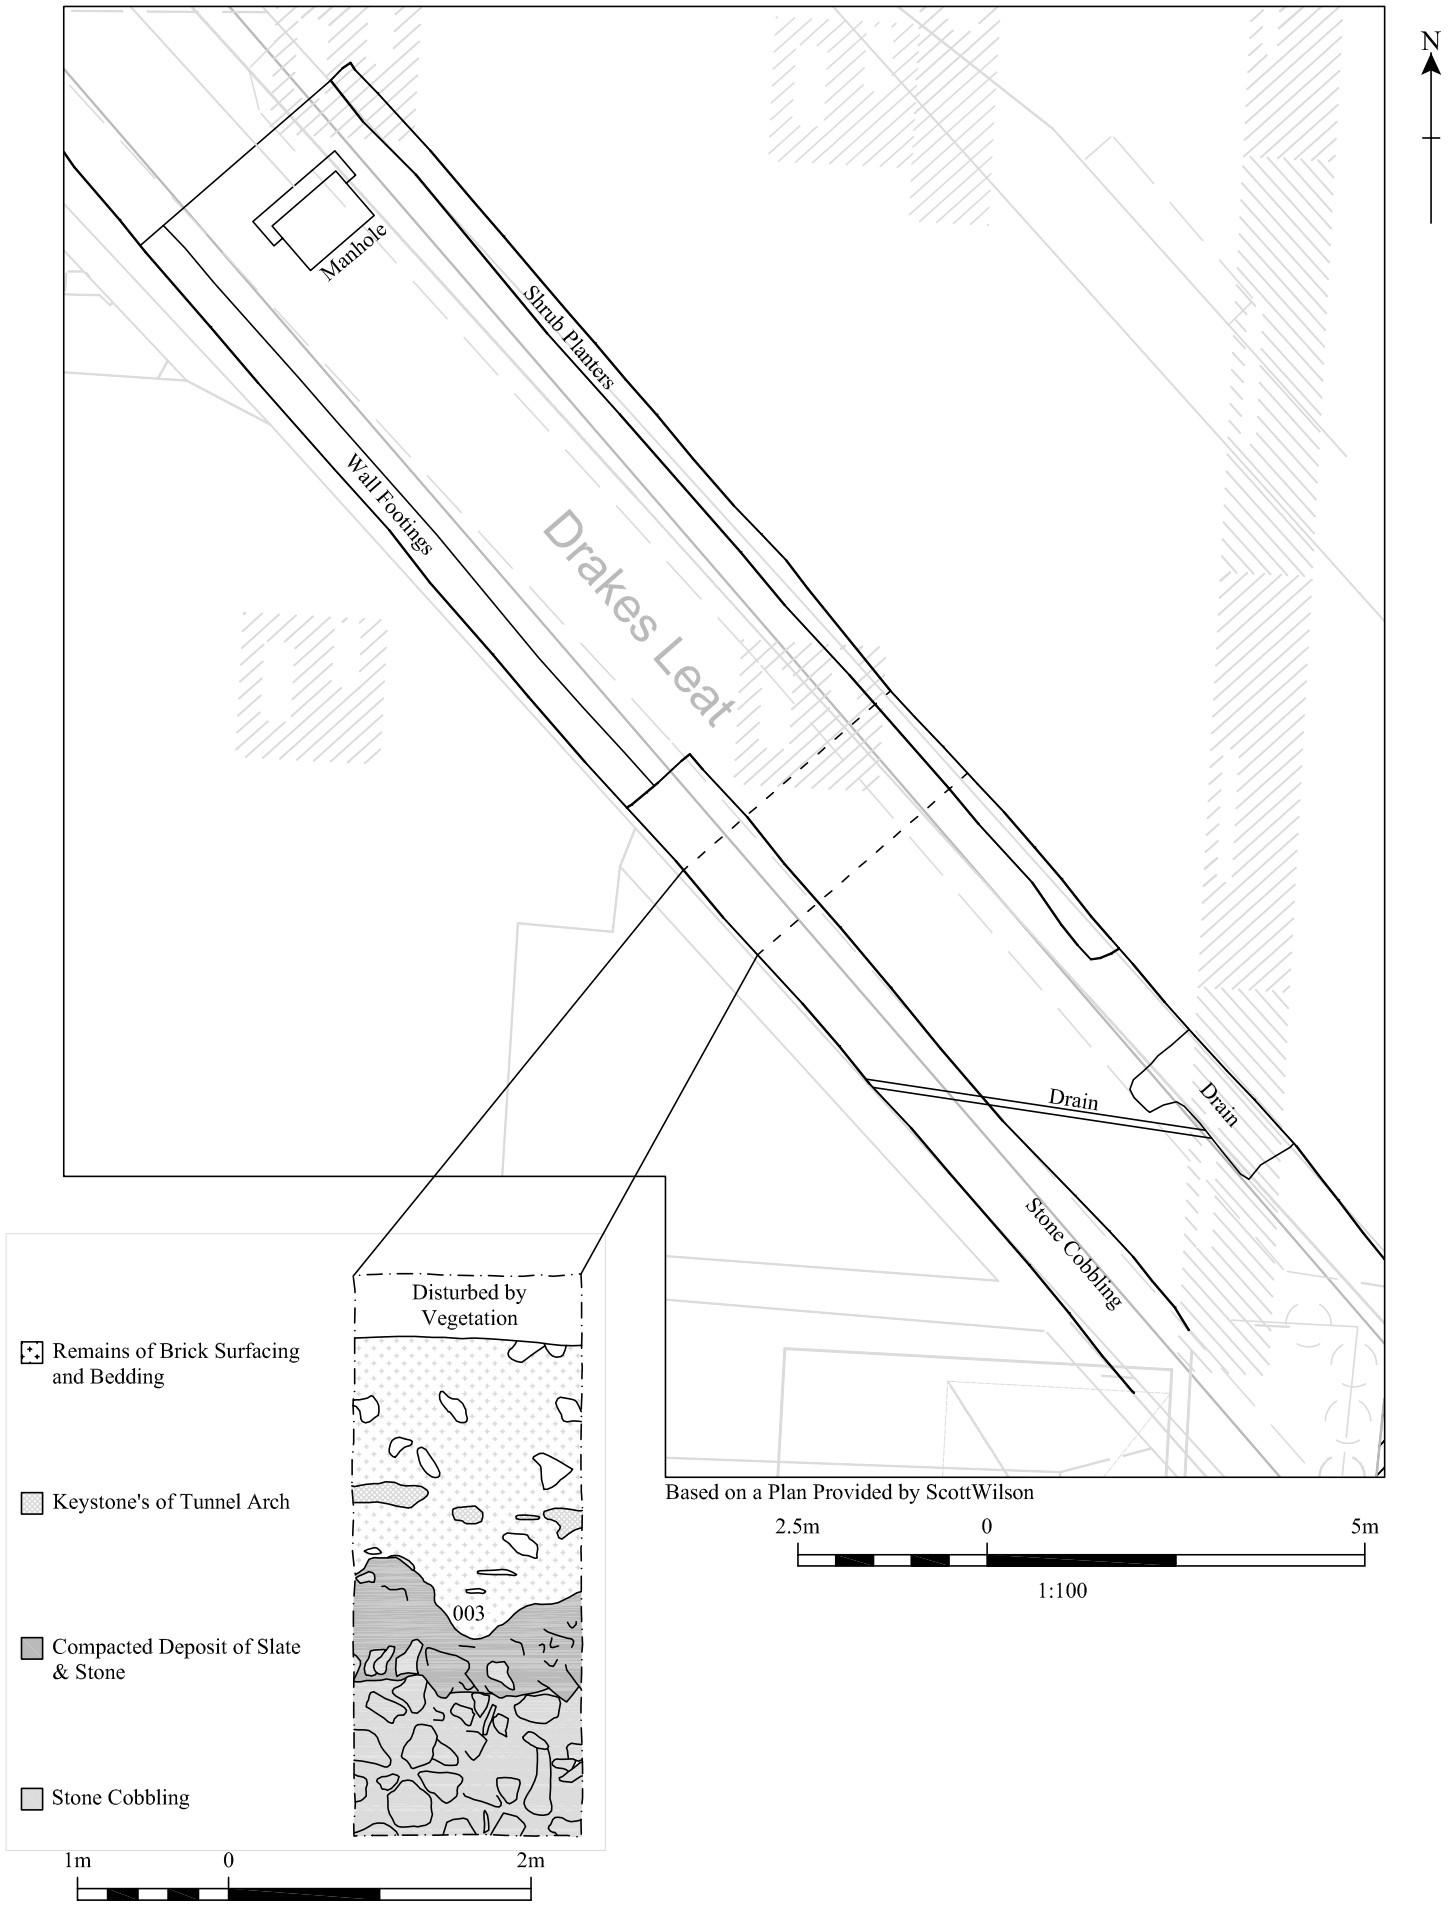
Detailed Plan of Post Medieval Surfaces (003)
